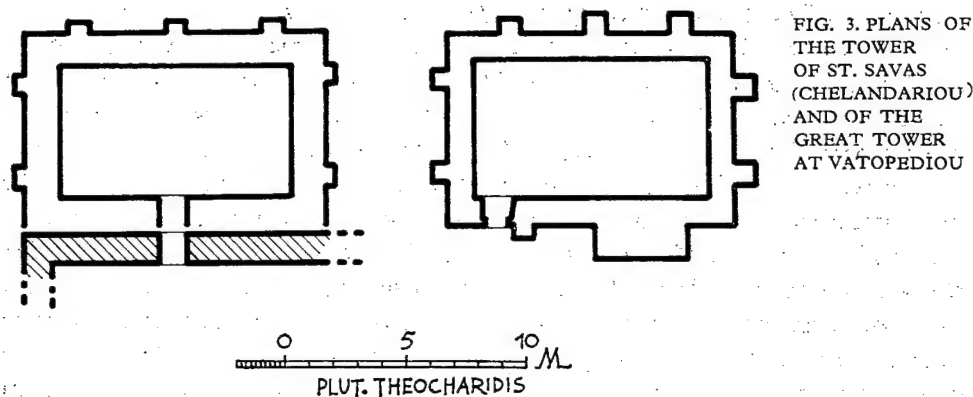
PLANS OF THE TOWER OF ST. SAVAS (CHELANDARIOU) AND OF THE GREAT TOWER AT VATOPEDIOU
